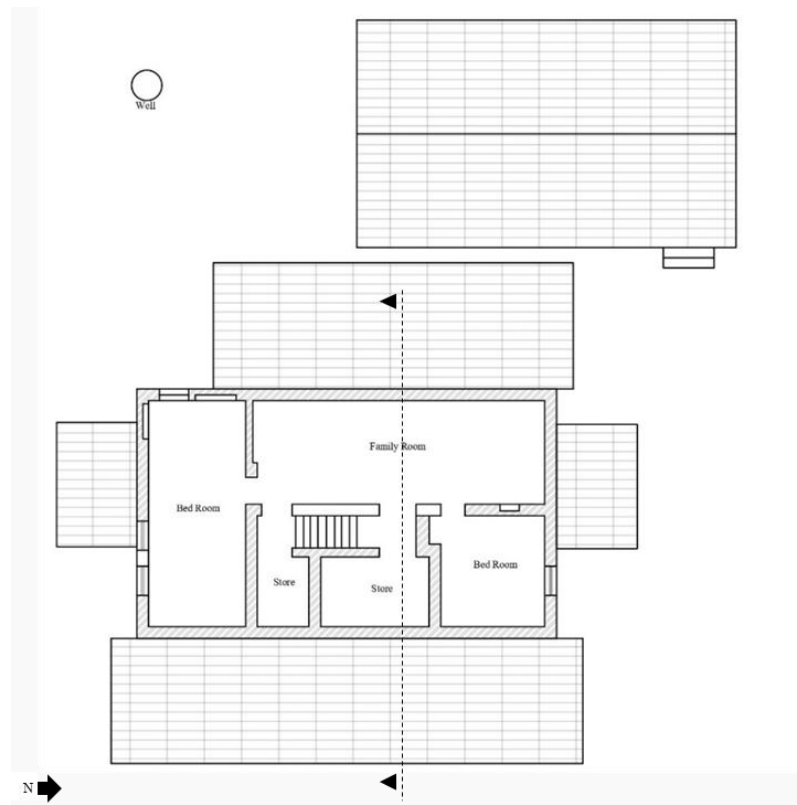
First Floor Plan of Paranjape House at Kelashi, Maharashtra, India (Source: Authors)
